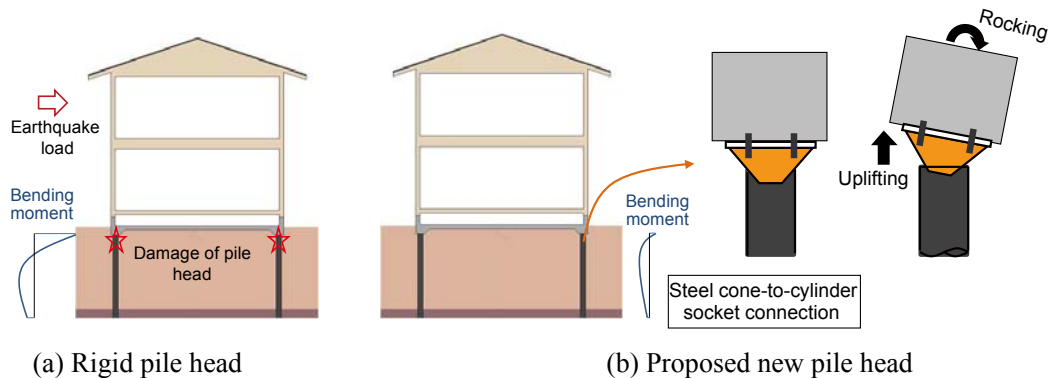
Major advantage of steel cone-to-cylinder socket connections
